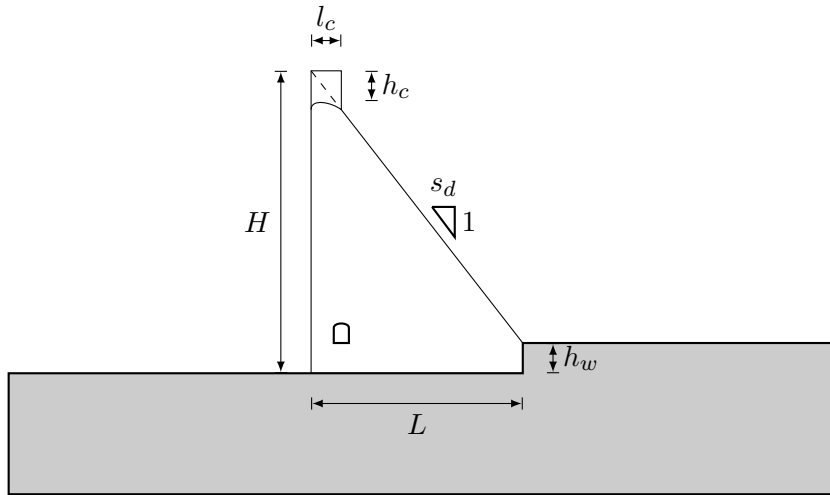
Practical cross-section profile of modern concrete gravity dams.
